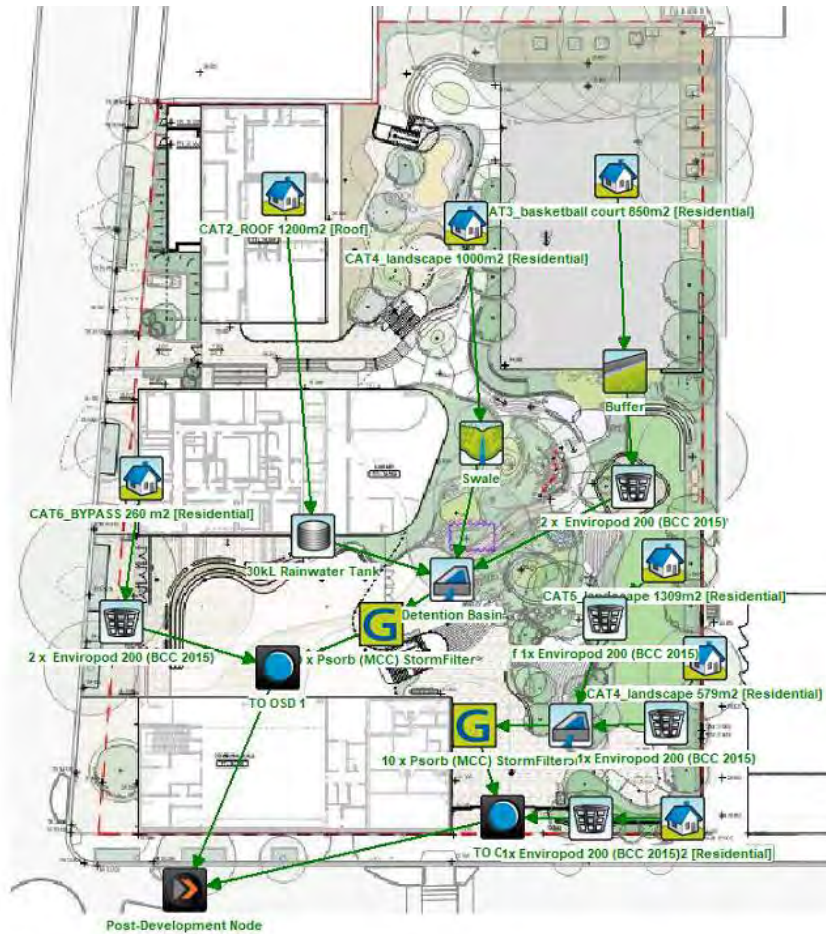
MUSIC Modelling Layout (Background on Architectural Plan Issued 01.04.2020)
